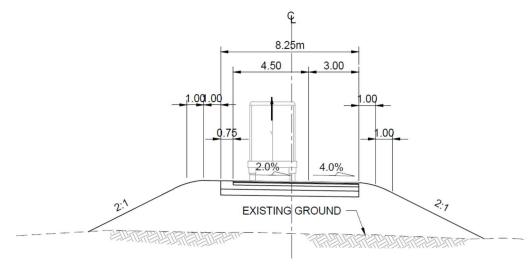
Typical Cross Section Embankment and Cut: Row=60m
